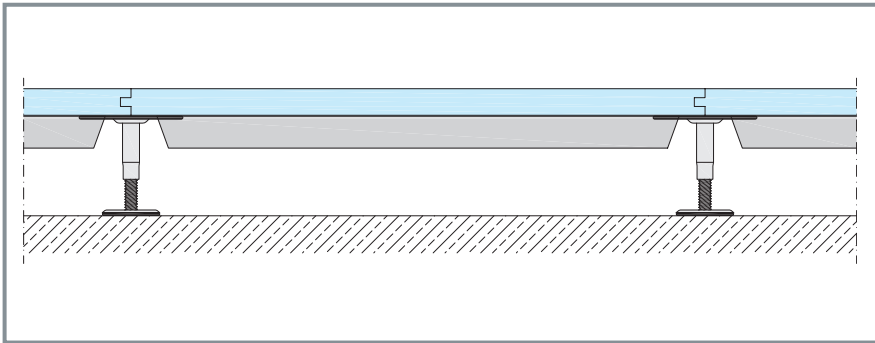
Hollow floors made using Knauf Integral GIFAfloor with service hatch F30/F60
